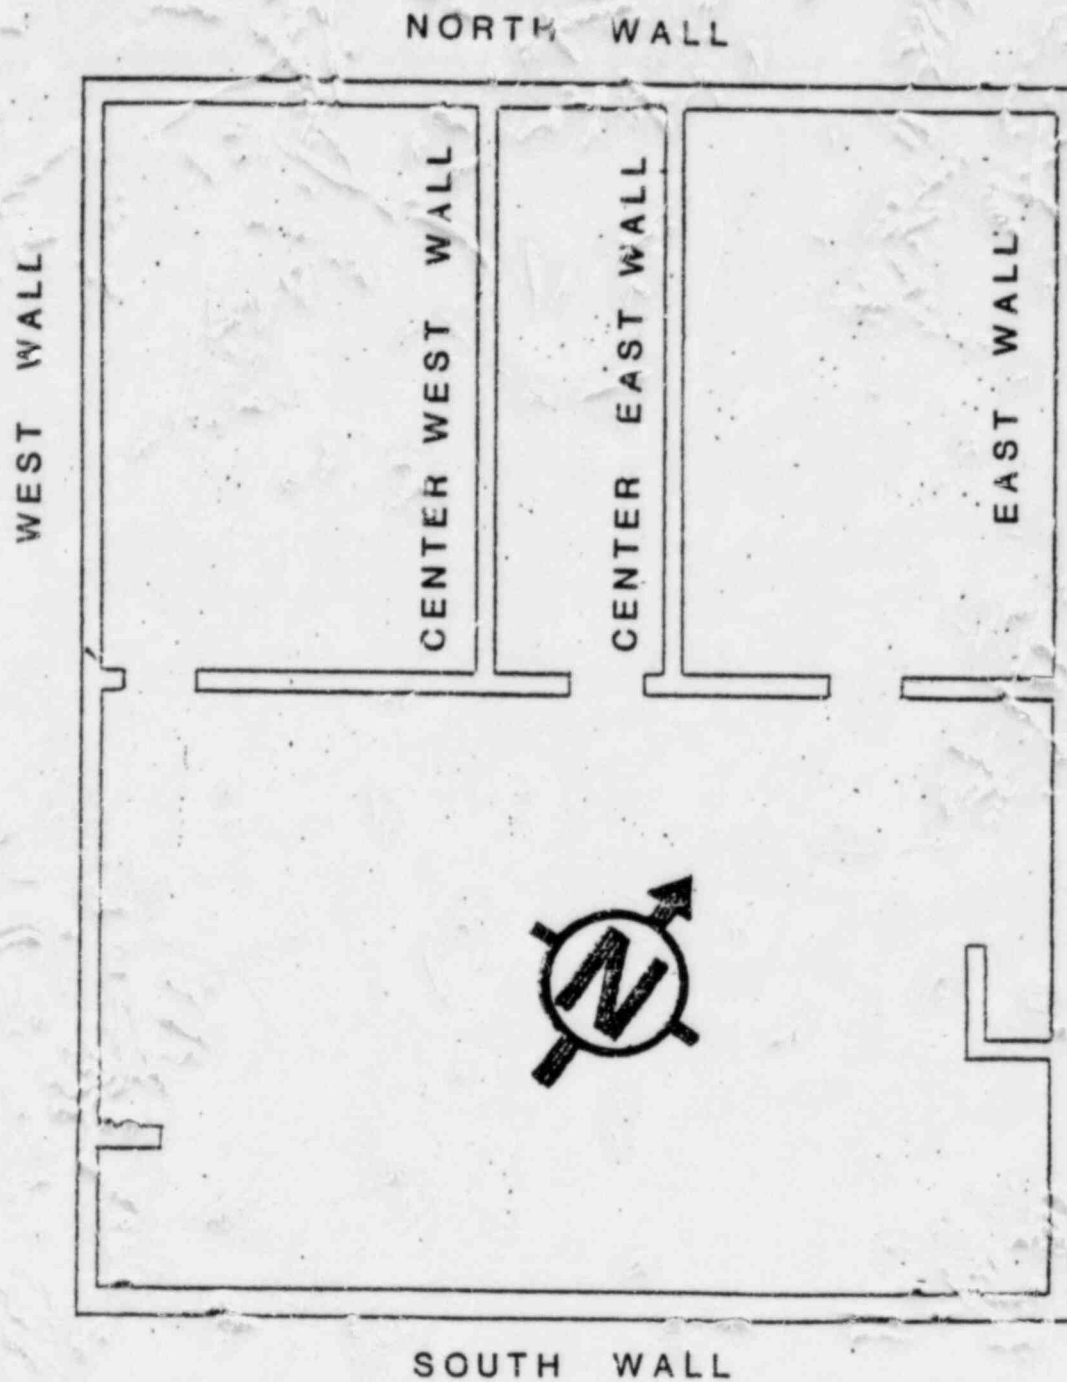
Wall Designations for Service Water Pump Structure at Elevation 634'-6"
